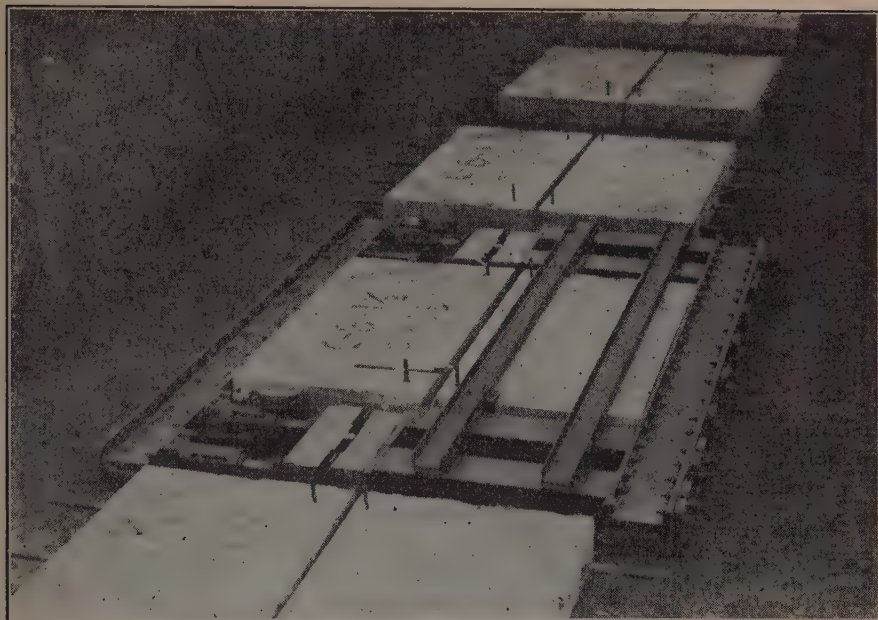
EQUIPMENT FOR OPENING A CONTRACTION JOINT.
